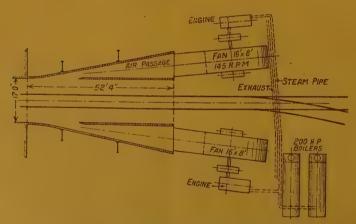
Plan of the ventilation nozzle at Gallitzen tunnel.
